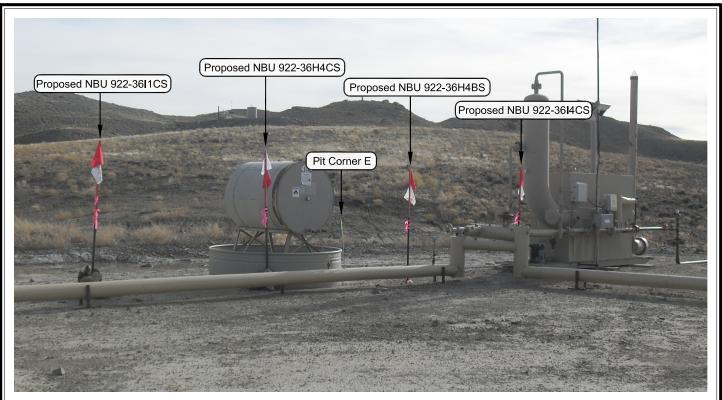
PHOTO VIEW: FROM LOCATION STAKE TO PIT CORNER E
